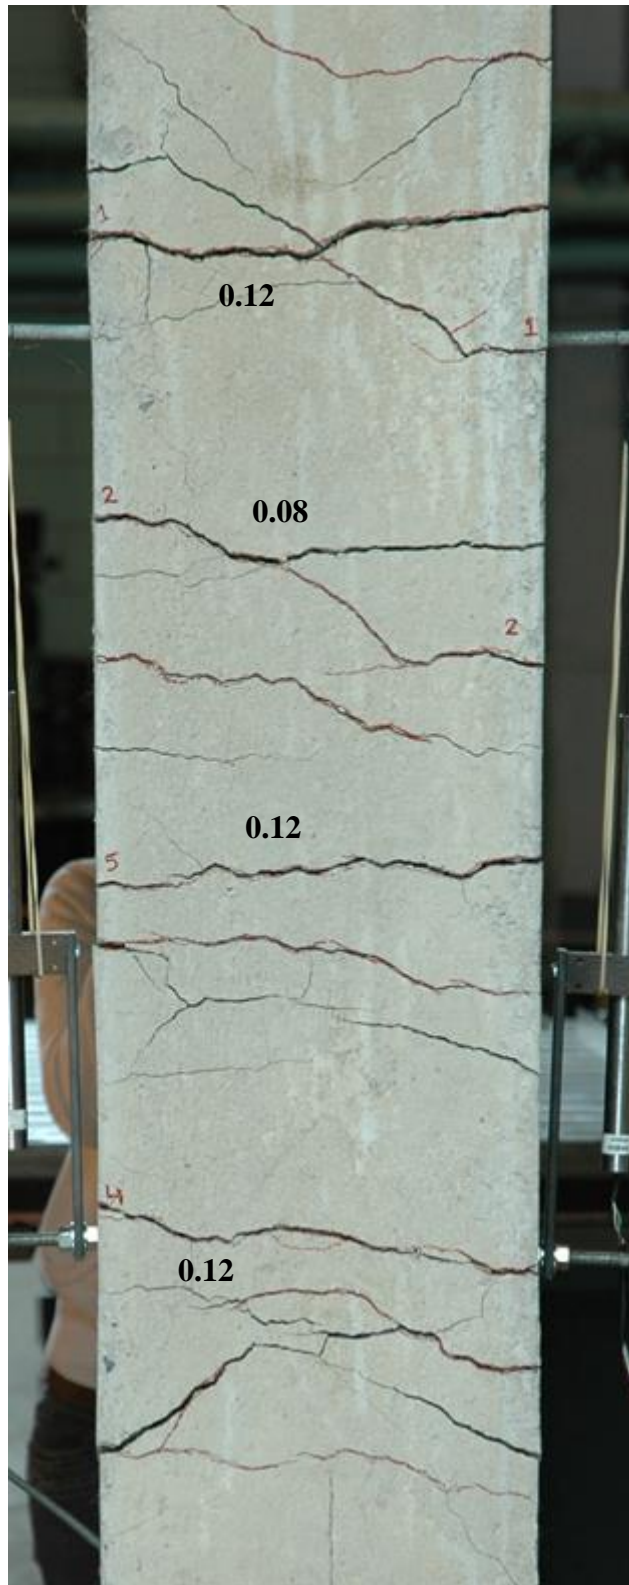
Cracks on west face of TS02 at Load Step 25
